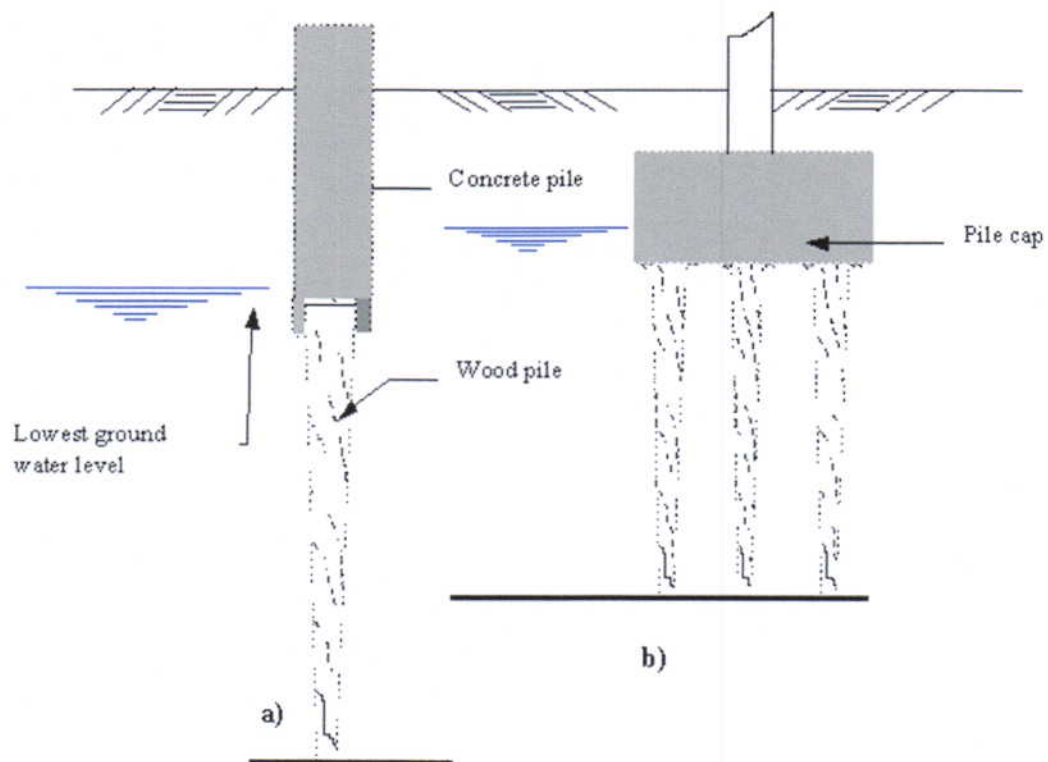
Protecting timber piles from decay: a) by pre-cast concrete upper section above water level. b) By extending pile cap below water level
